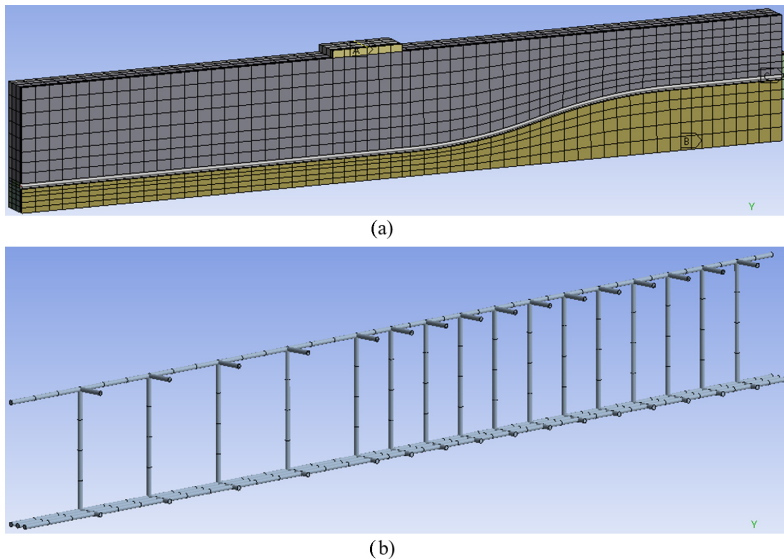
Cross-section through model of prestressed concrete beam with unbonded tendons (a) and passive reinforcement model (b)
